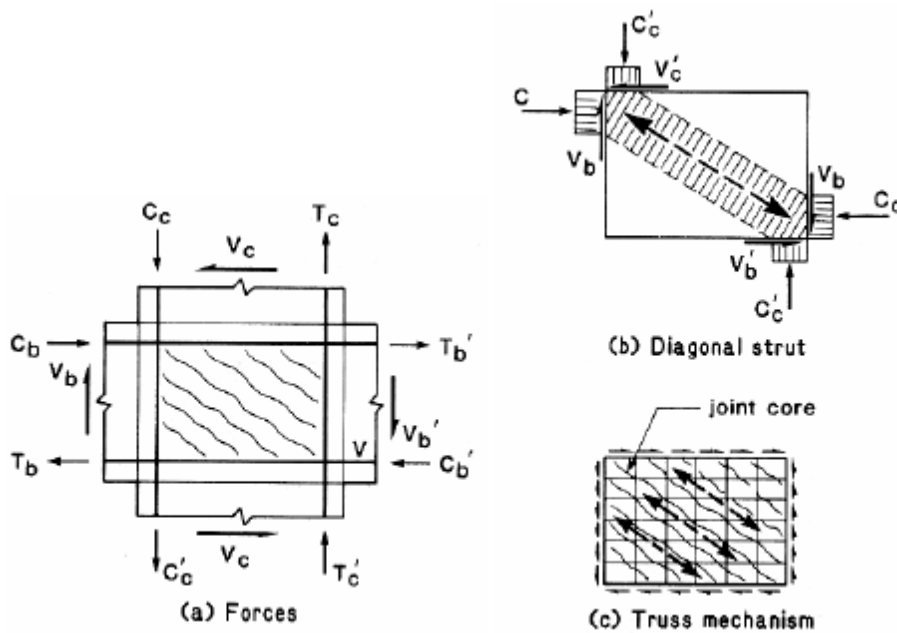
Forces and postulated shear-resisting mechanisms in a typical interior beam-column joint: forces acting on beam-column joint (a); diagonal strut mechanism (b); truss mechanism (c).
